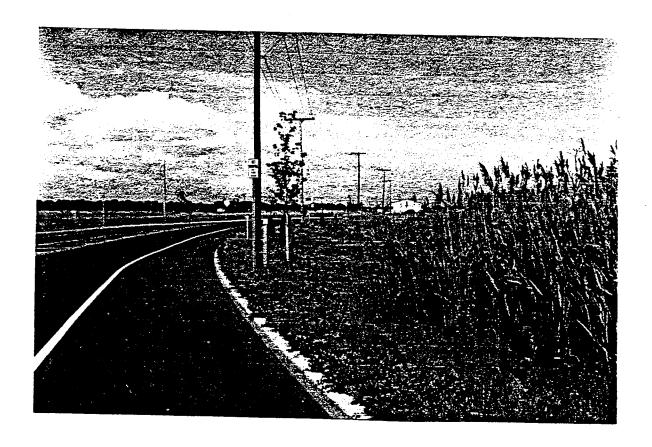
Berm carrying new alignment of Port Monmouth Road through wetlands, east of Pews Creek. Site of Port Monmouth floodwall. View to west. Photographer: Wendy Harris, June 1998.
